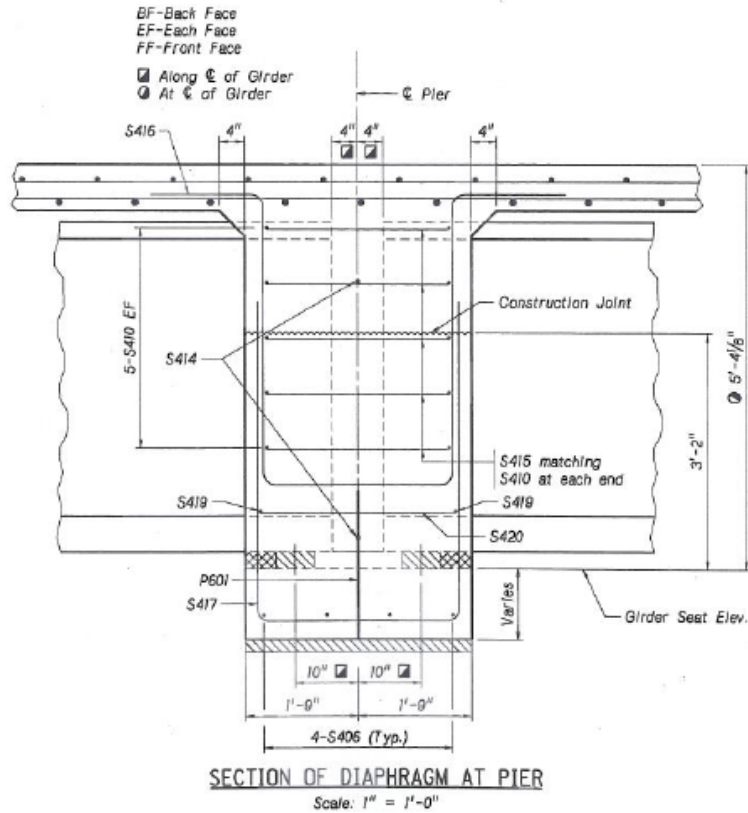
Typical Nebraska Department of Roads Details of Diaphragm at Pier
